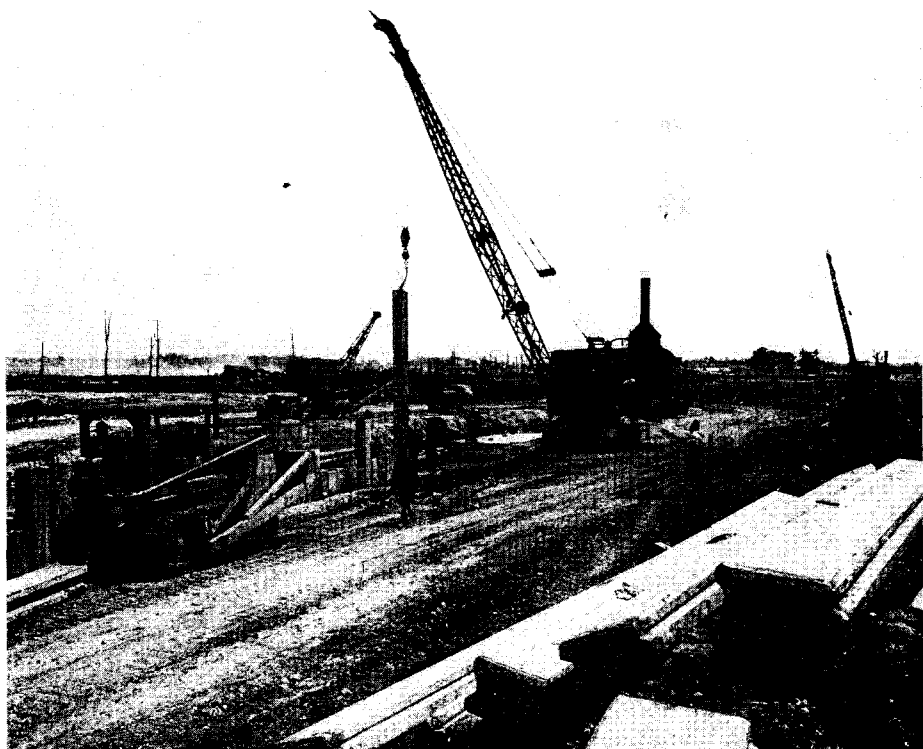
Navy Drainage Project for Elimination of Mosquito Hazard, Boush Creek, Norfolk, Virginia. Placing and driving piling for 1,400 feet of 24 foot canal through an area of hydraulic fill.
